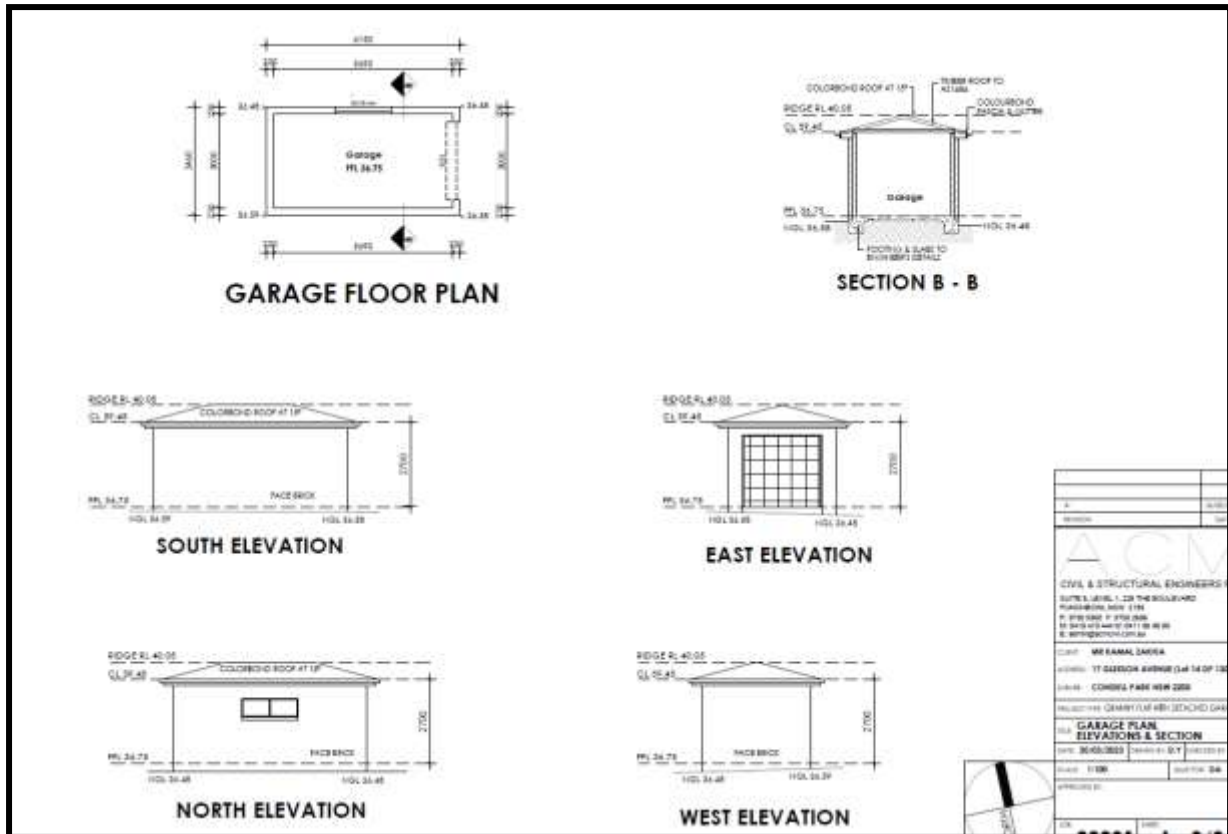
Garage Floor Plan, Elevations and Sections. Source: ACM Civil & Structural Engineers
